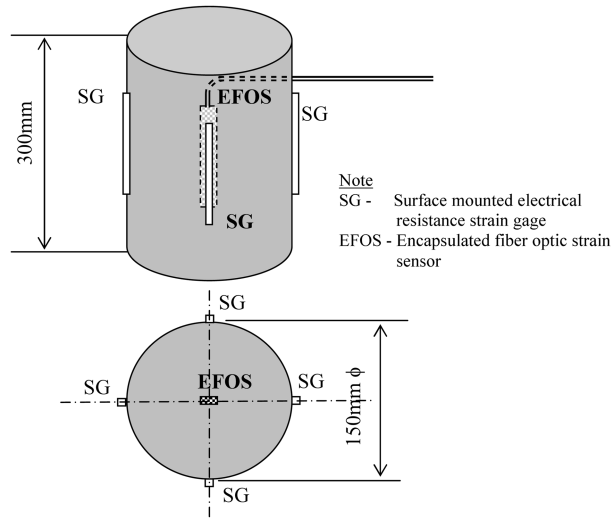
Instrumentation details of concrete cylinder with encapsulated fiber optic sensor
